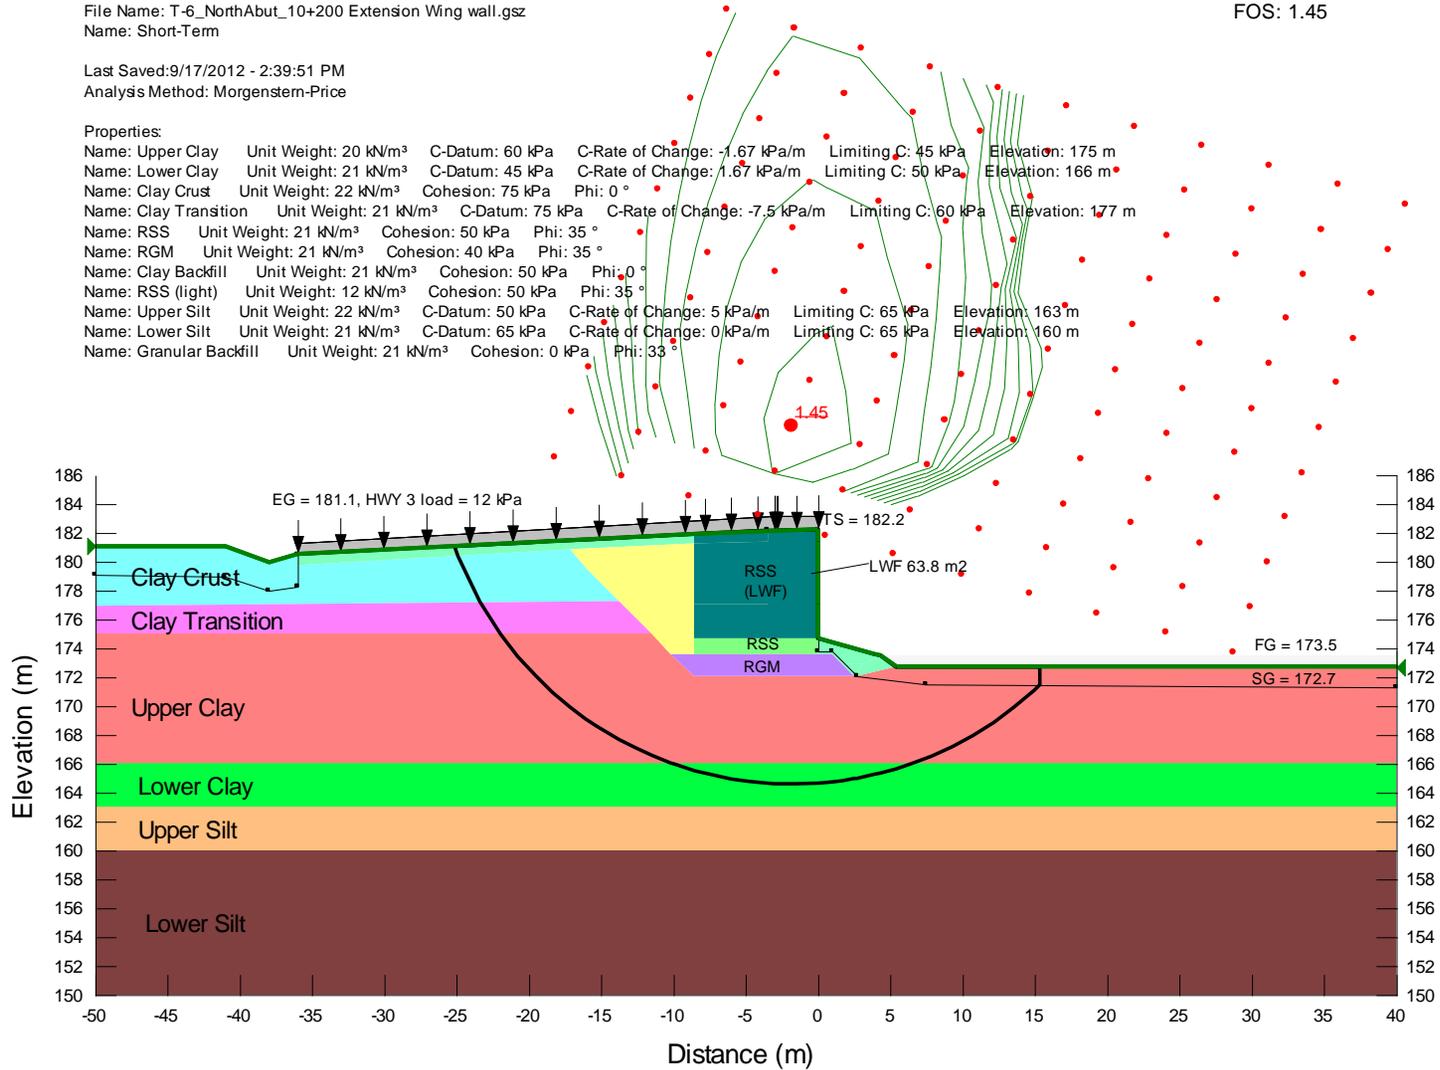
Global Stability Result – Extended Wing Wall North (10+200) – End of Construction (Undrained) Loading
